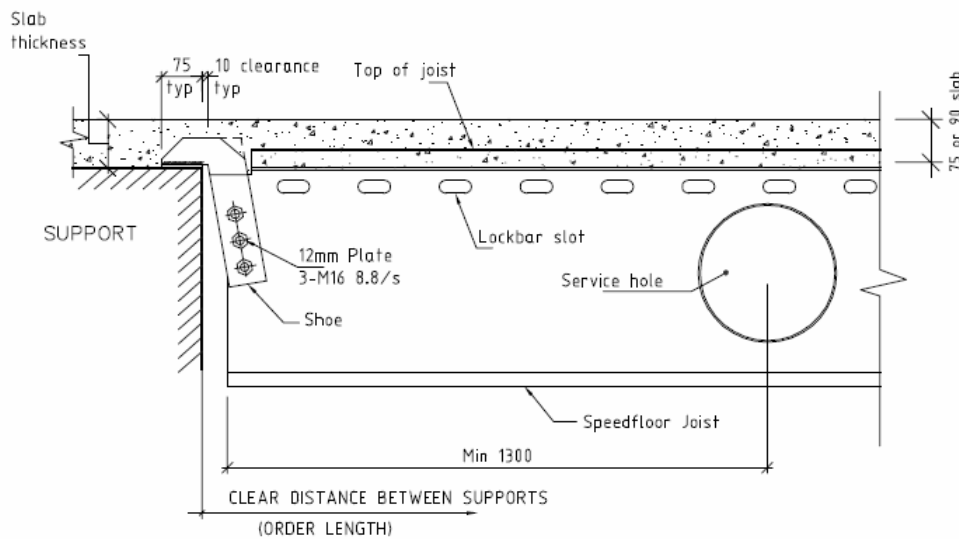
Cross-Section of Speedfloor Steel Joist System
